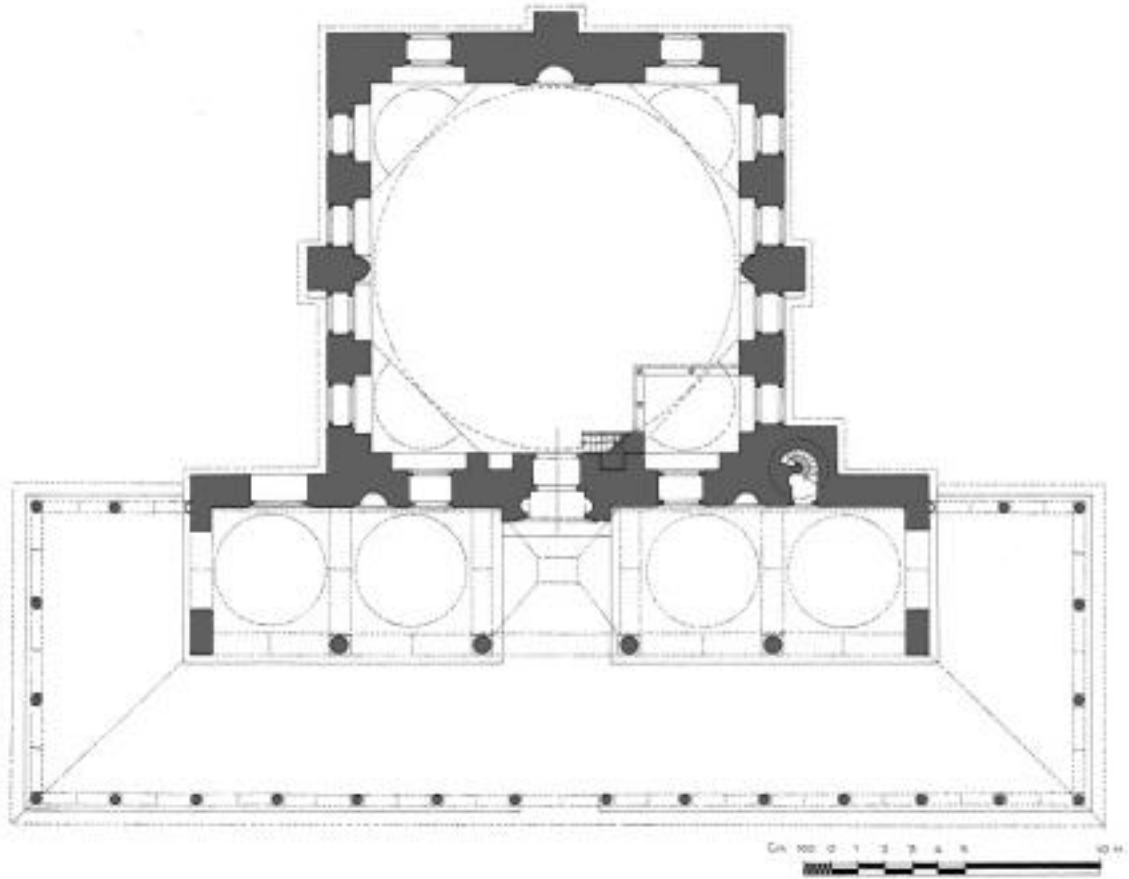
Tekirdağ Rüstem Pasha Mosque floor plan (*Vakıflar Bölge Müdürlüğü*, 2020)
